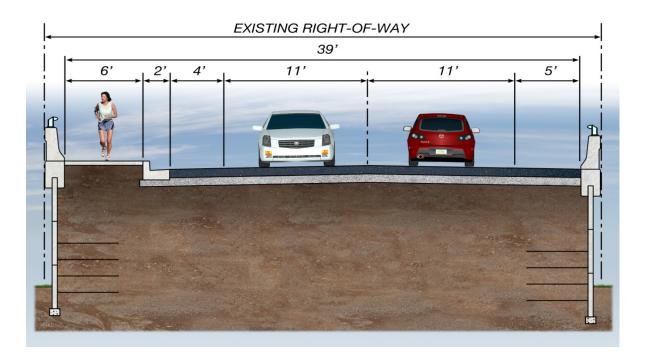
Proposed Roadway Section East of Proposed Fixed Bridge
